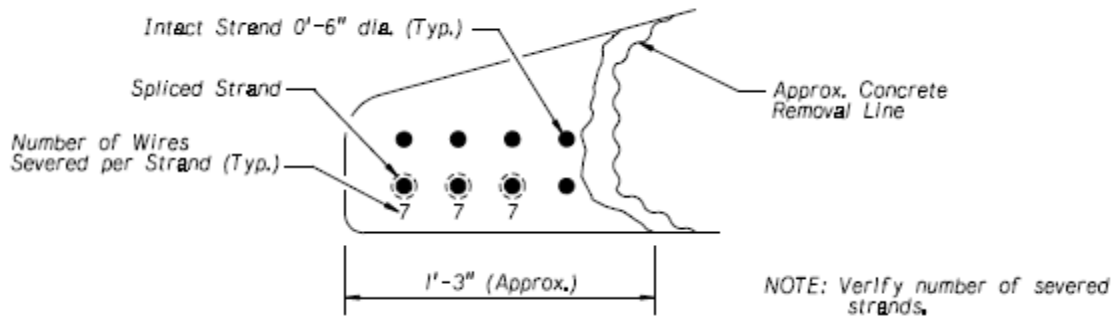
Spliced strands, Scottsbluff Gering Bypass Bridge, courtesy of NDOT
